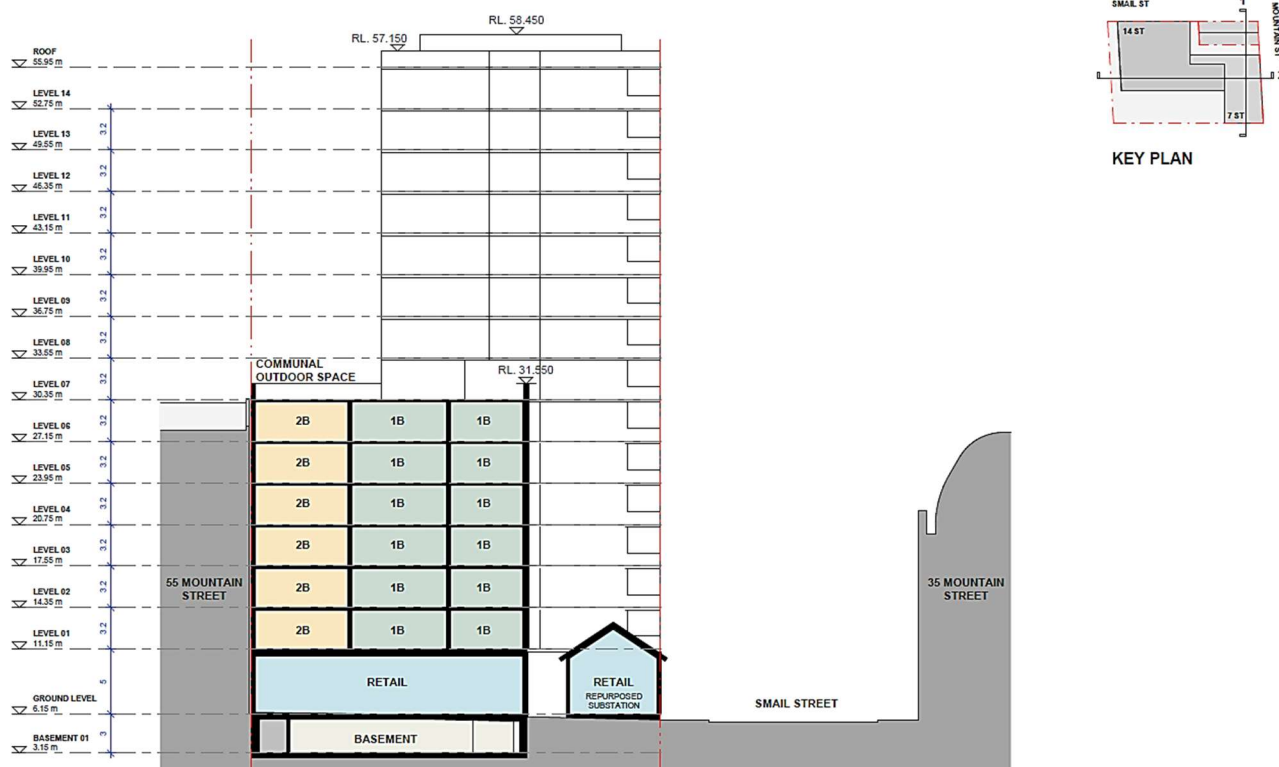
Proposed planning proposal Section 1 (PP10.01).
